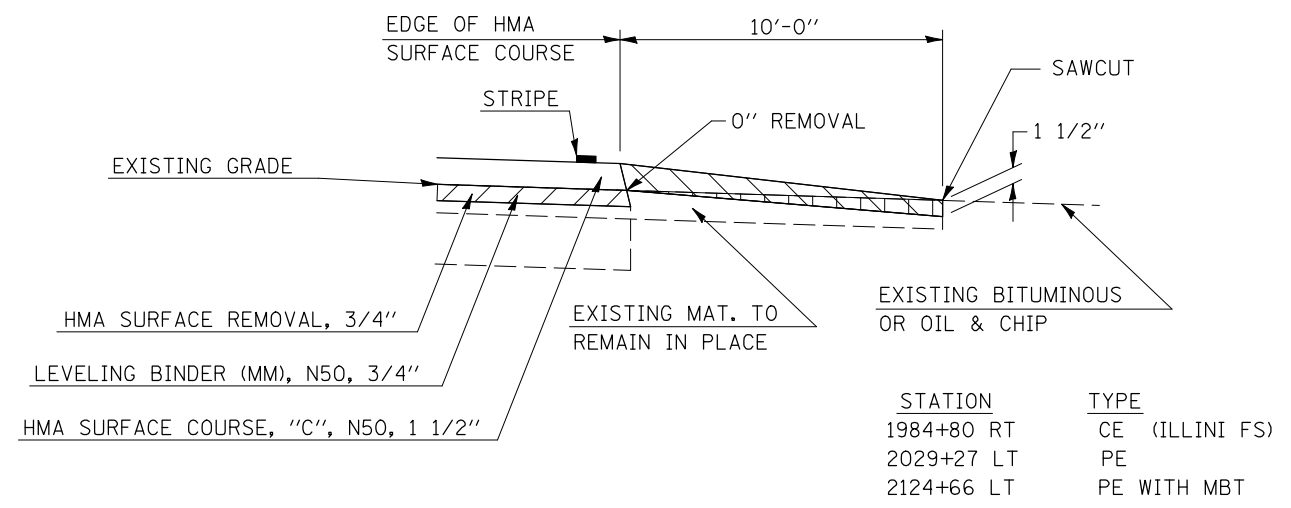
DETAIL OF HOT-MIX ASPHALT SURFACE REMOVAL – BUTT JOINT
